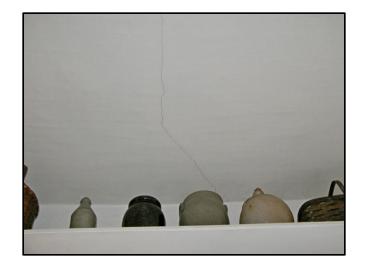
Attic girder at top of staircase from second floor to attic.
